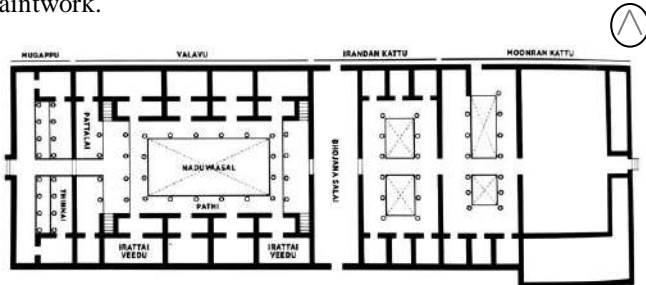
Plan of C.V.C.T –C.V.R.M House
